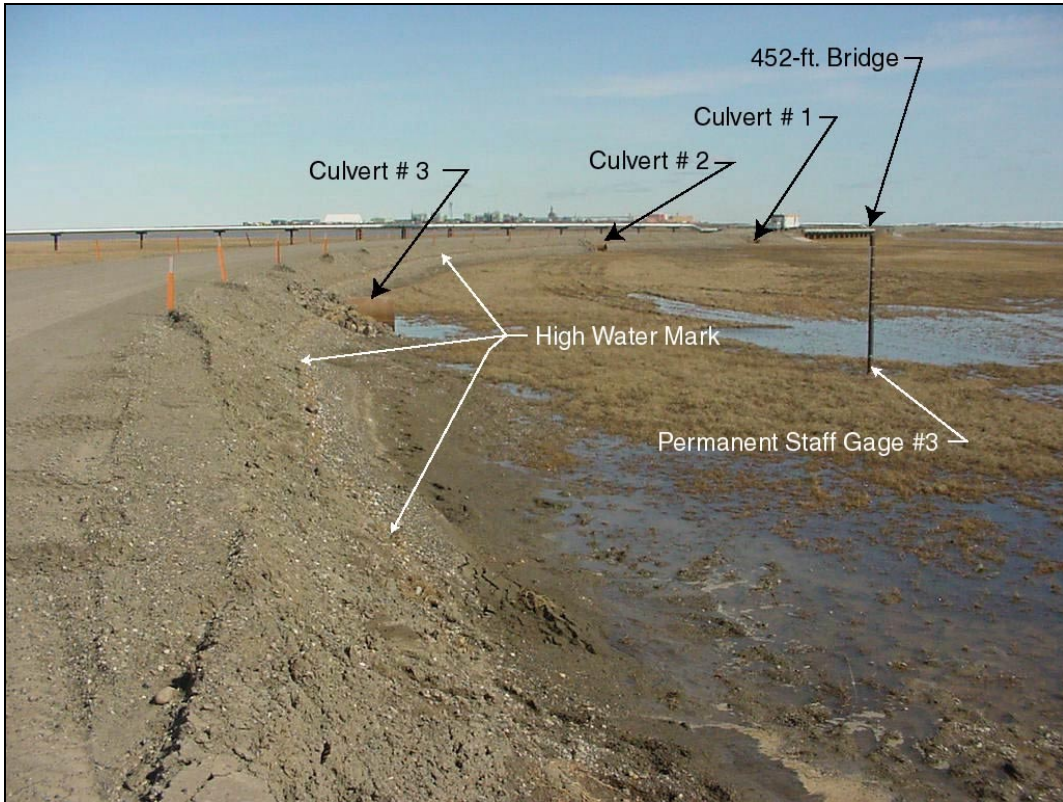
Facing east from Culvert #10 along the north side of the CD-2 access road. Photo taken June 16, 2001.
